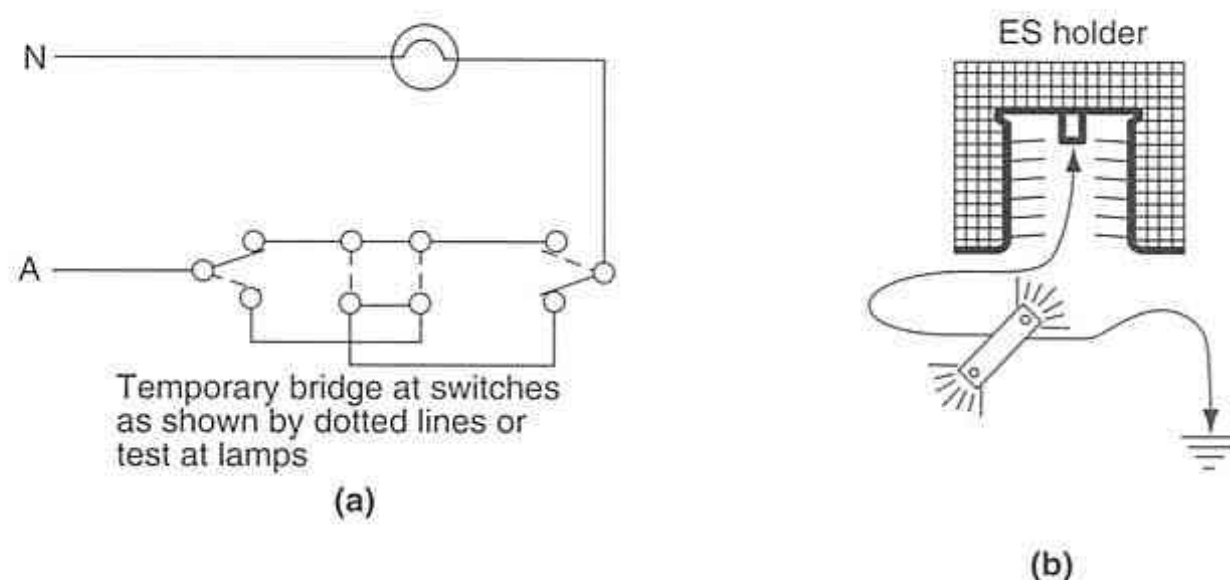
Polarity testing multiposition controlled lighting and Edison screw (ES) lampholders
